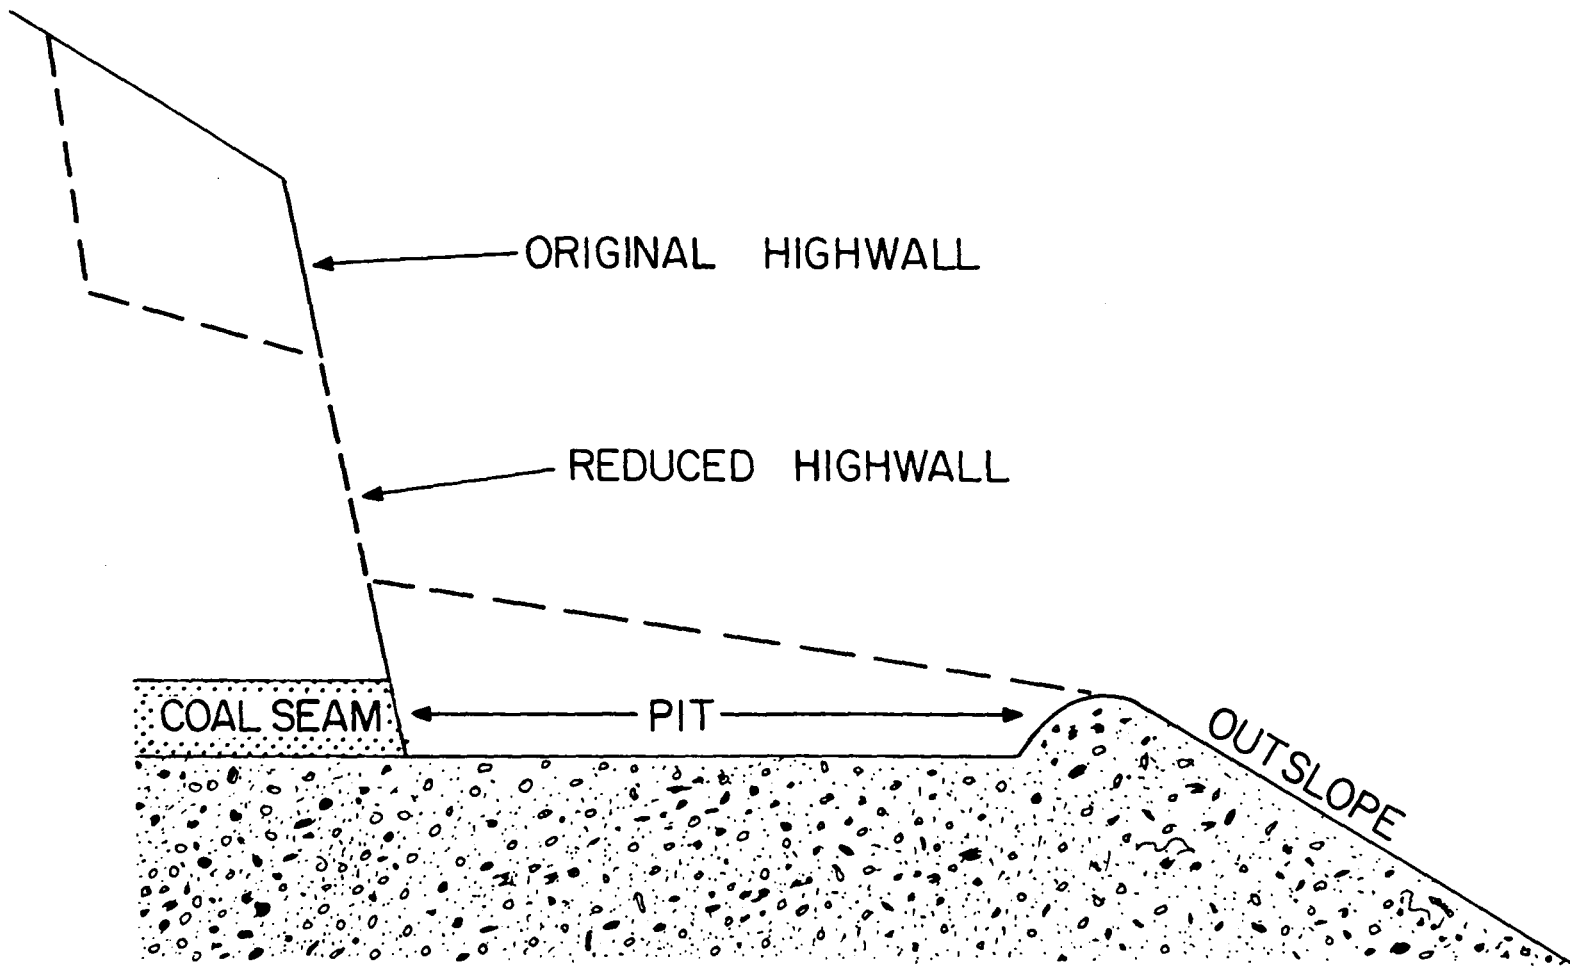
Crosssectional diagram of a terrace type highwall reduction and subsequent pit fill.
